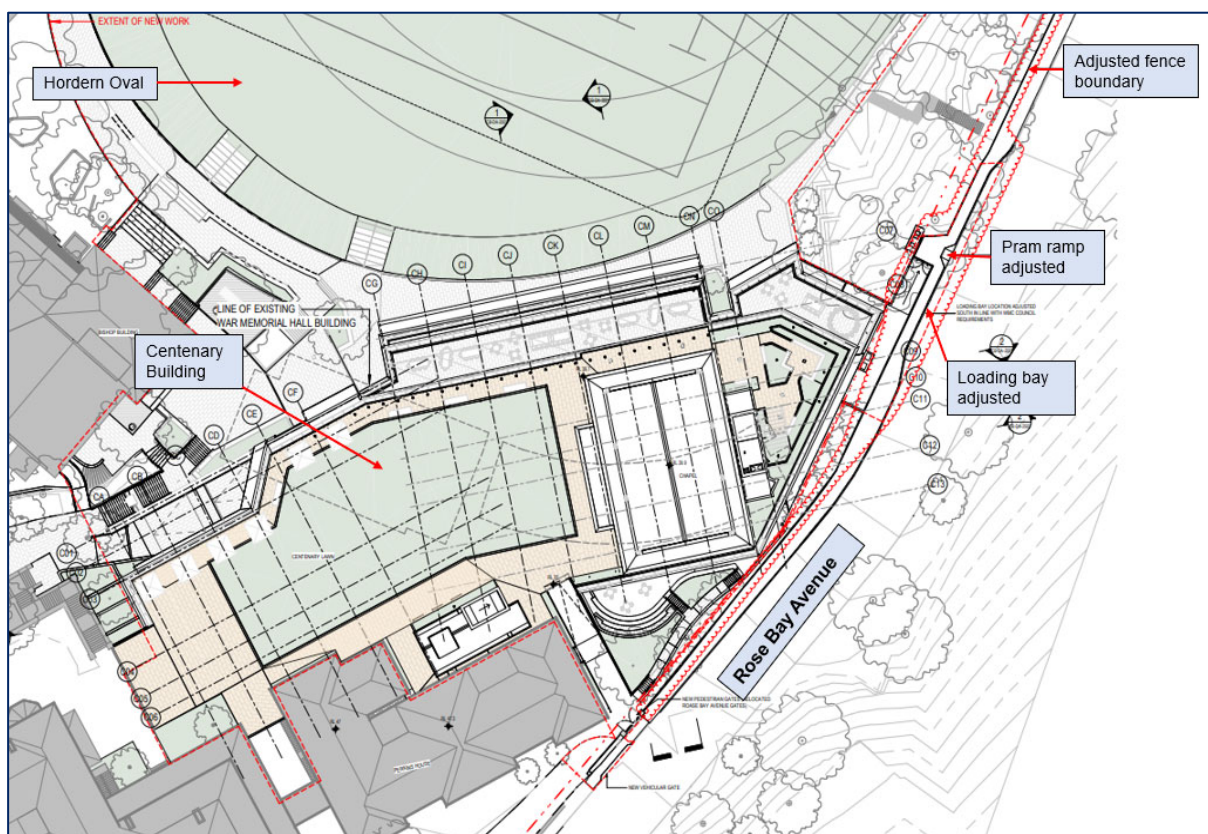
| Proposed design amendments, Cranbrook School (Source: Applicant's Modification Report 2021)
